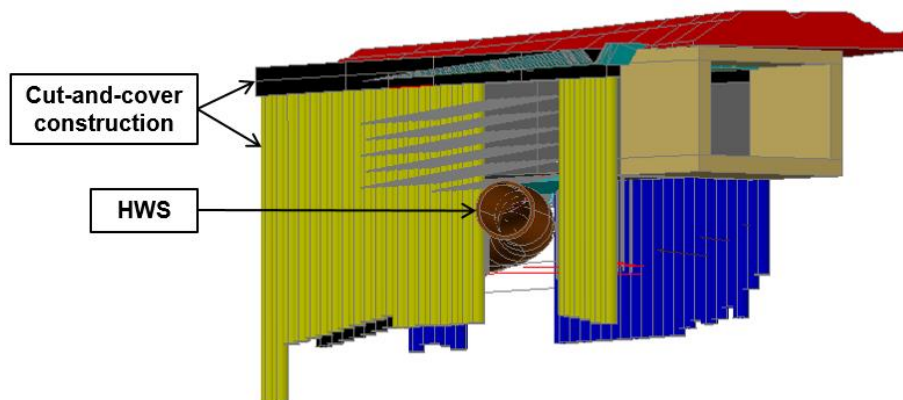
3D model illustrating the newly-built cut-and-cover construction and the existing subjacent HWS drainage tunnel
